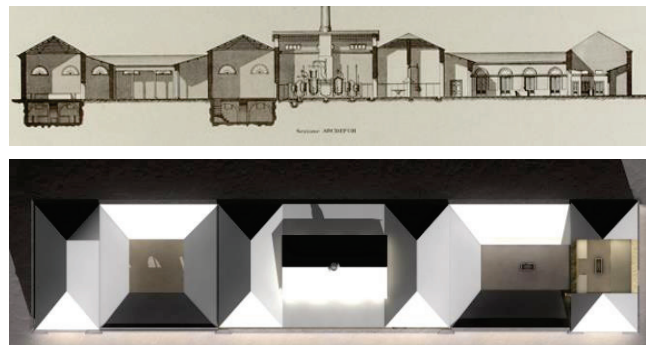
Original Design of Longitudinal Section and the roof-level plan, view of 3D Modelling
